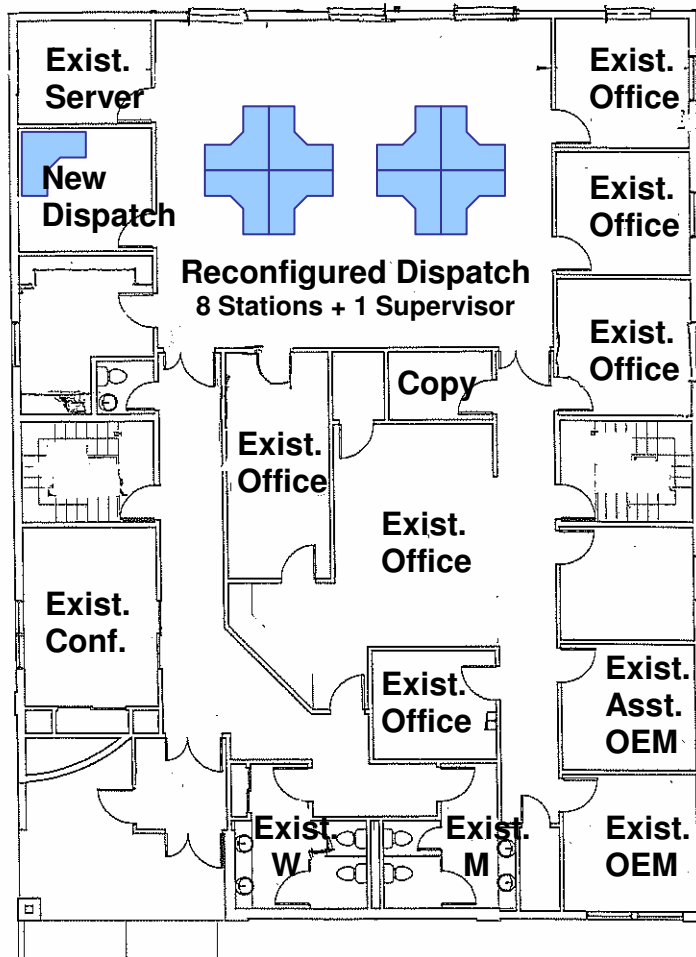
Scenario 2 - Proposed 1st Floor Layout
